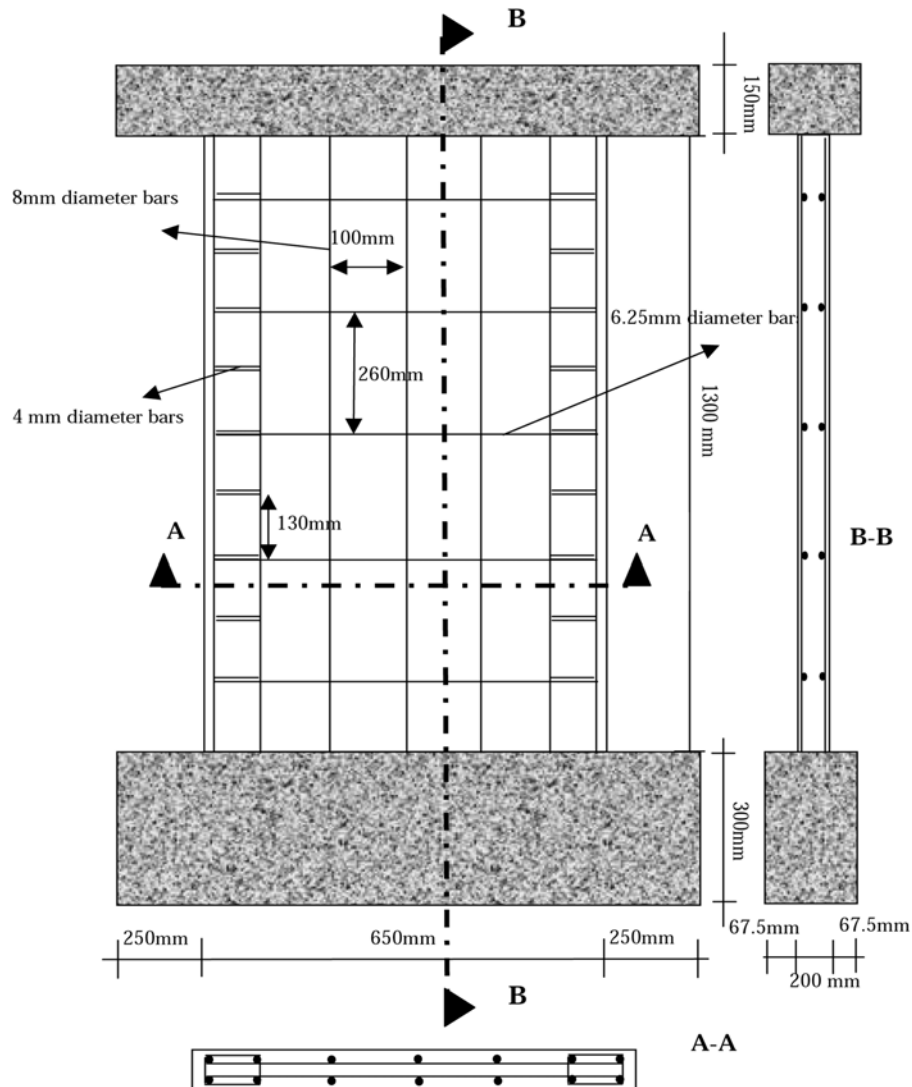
Arrangement of the reinforcement for the RC walls tested
